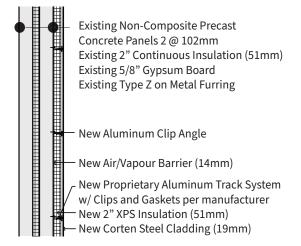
Proposed Exterior Corten Steel Wall Detail.
